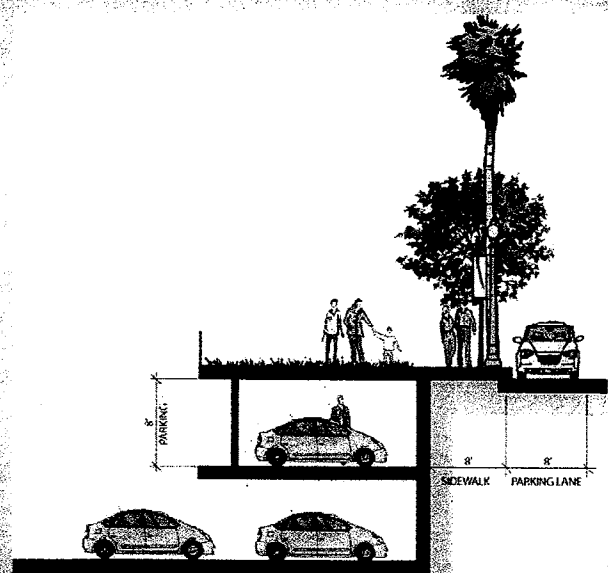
Potential "tuck-under" style parking. Tiered parking is permitted in District 7
